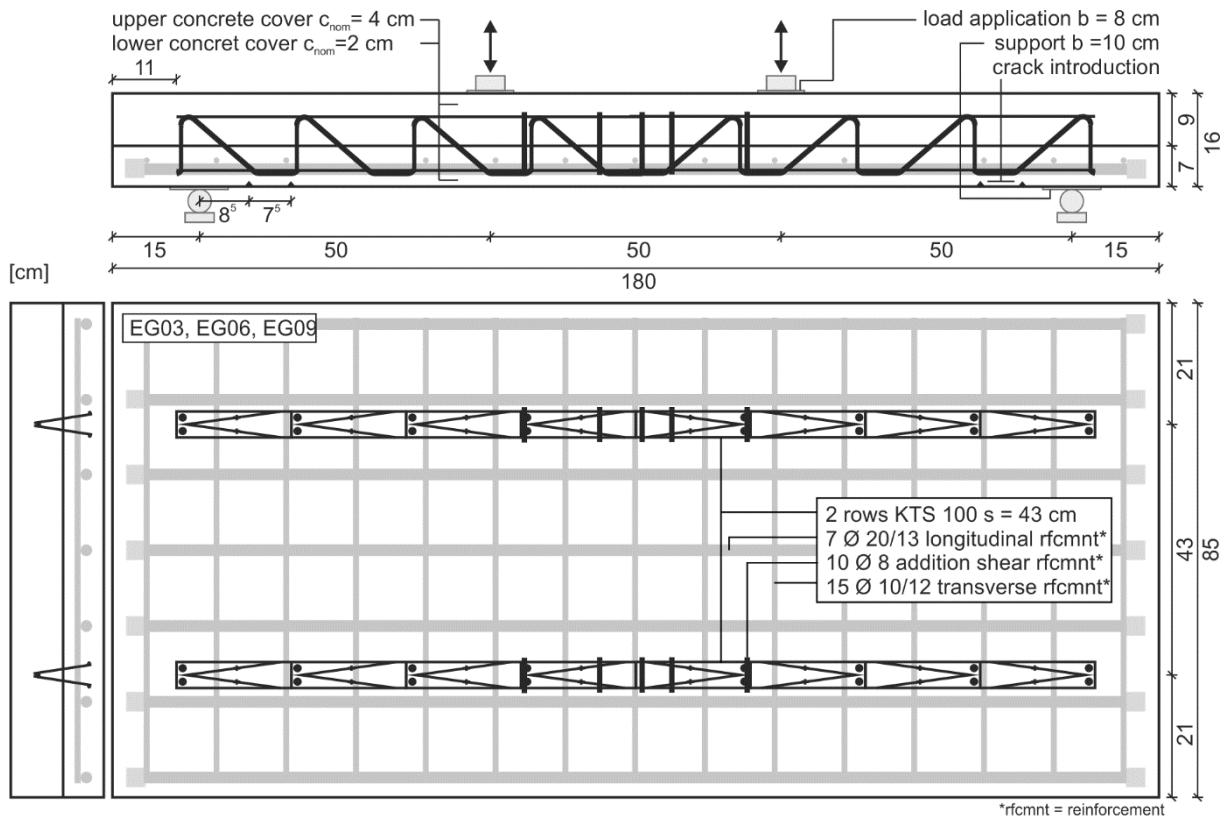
Reinforcement and formwork detail of specimens EG03, EG06 and EG09
